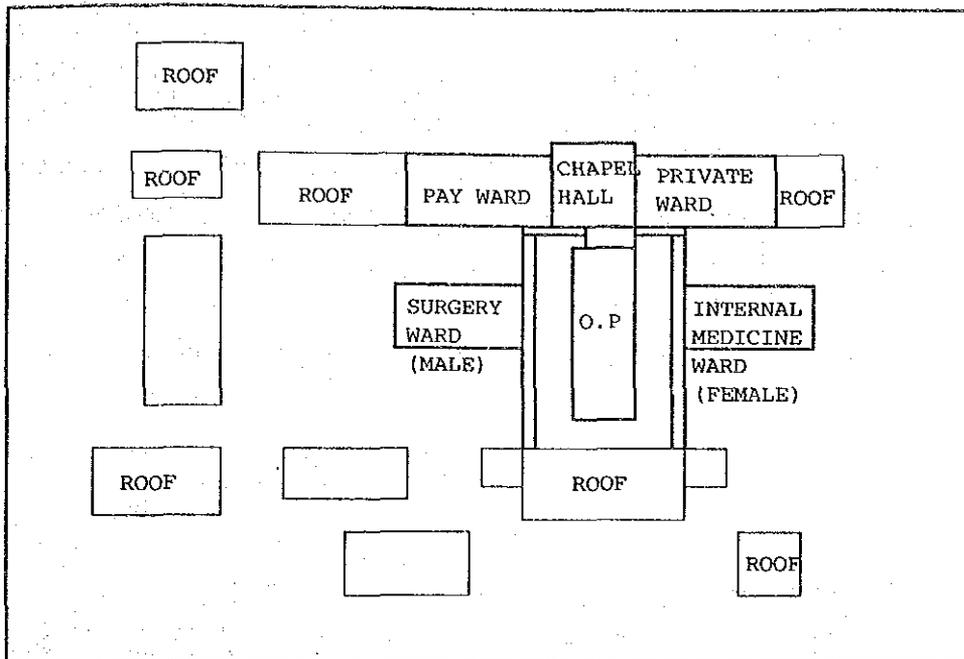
Layout Plan of Major Existing VSMC's Facilities
